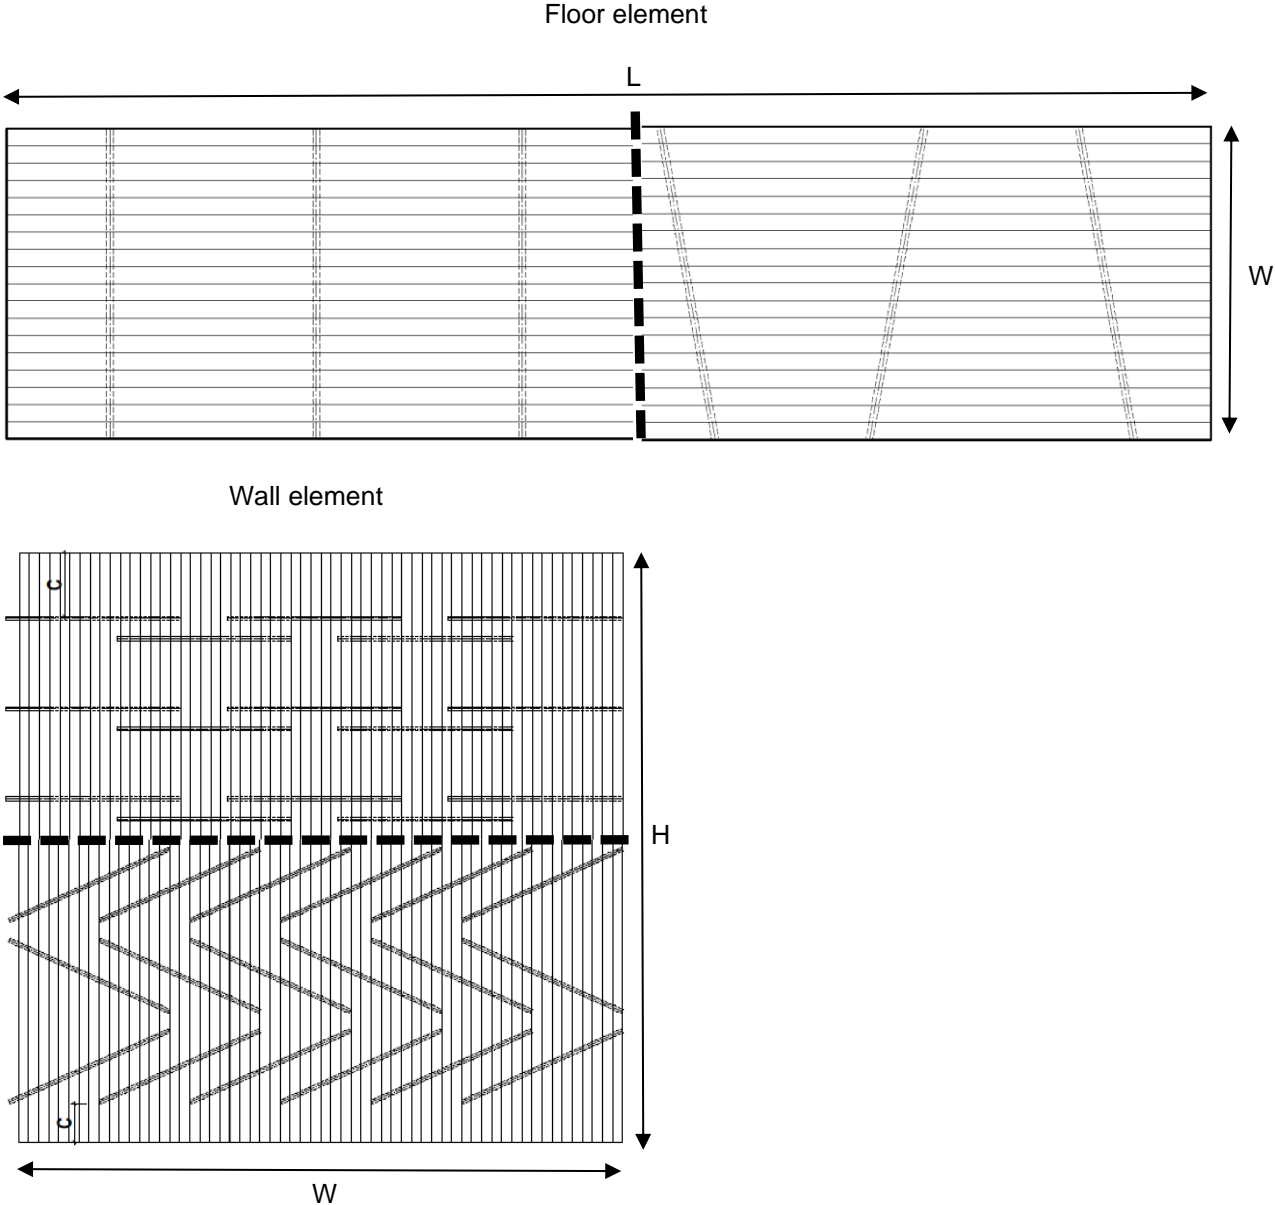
Geometry of dowel-type fasteners made of hardwood
